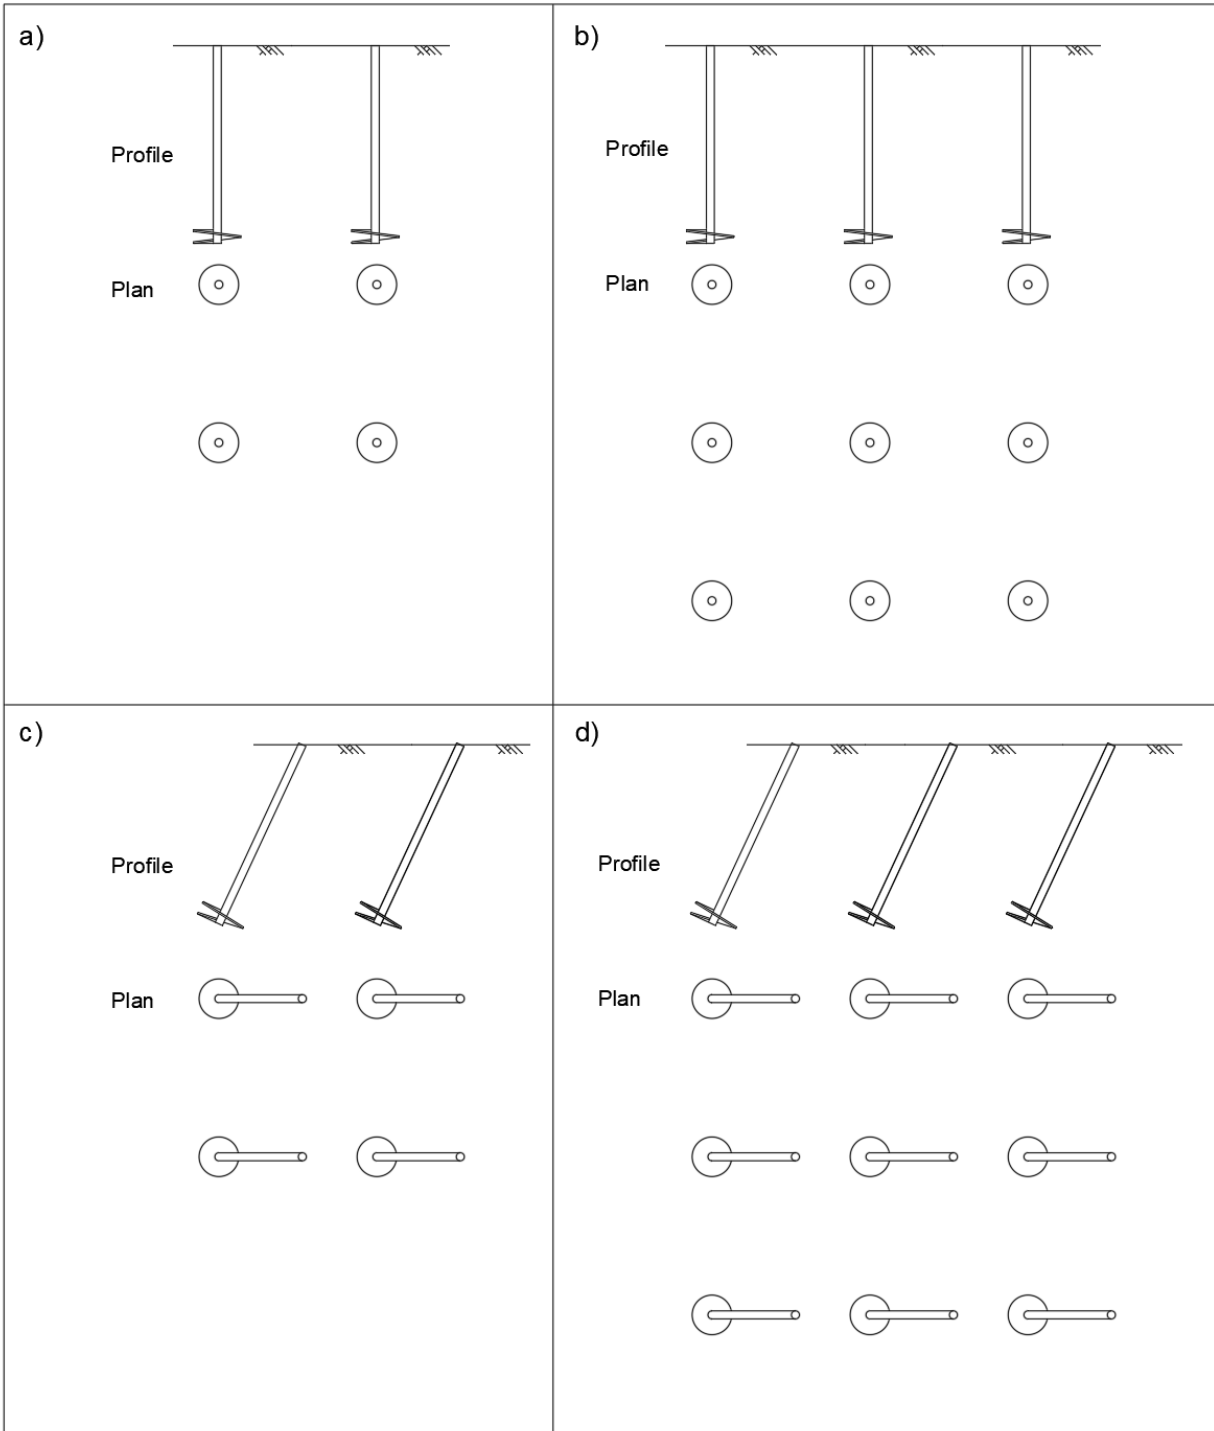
Helical Pile Groups Profile and Plan View: a) 2x2 Vertical, b) 3x3 Vertical, c) 2x2 25° Batter, d) 3x3 25° Batter.
